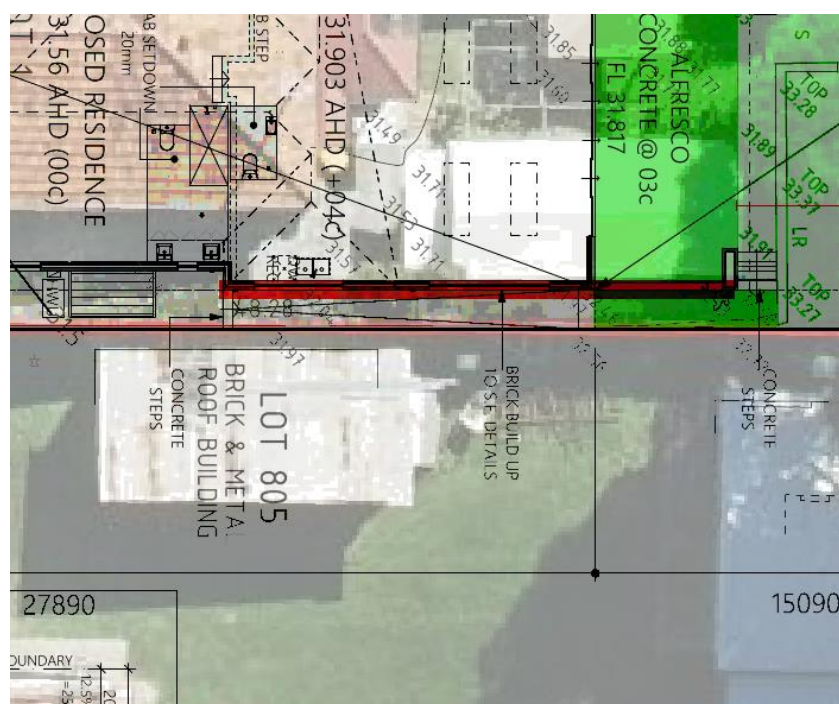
Images of Kitchen/Alfresco wall and the impacted area on adjoining southern lot.
